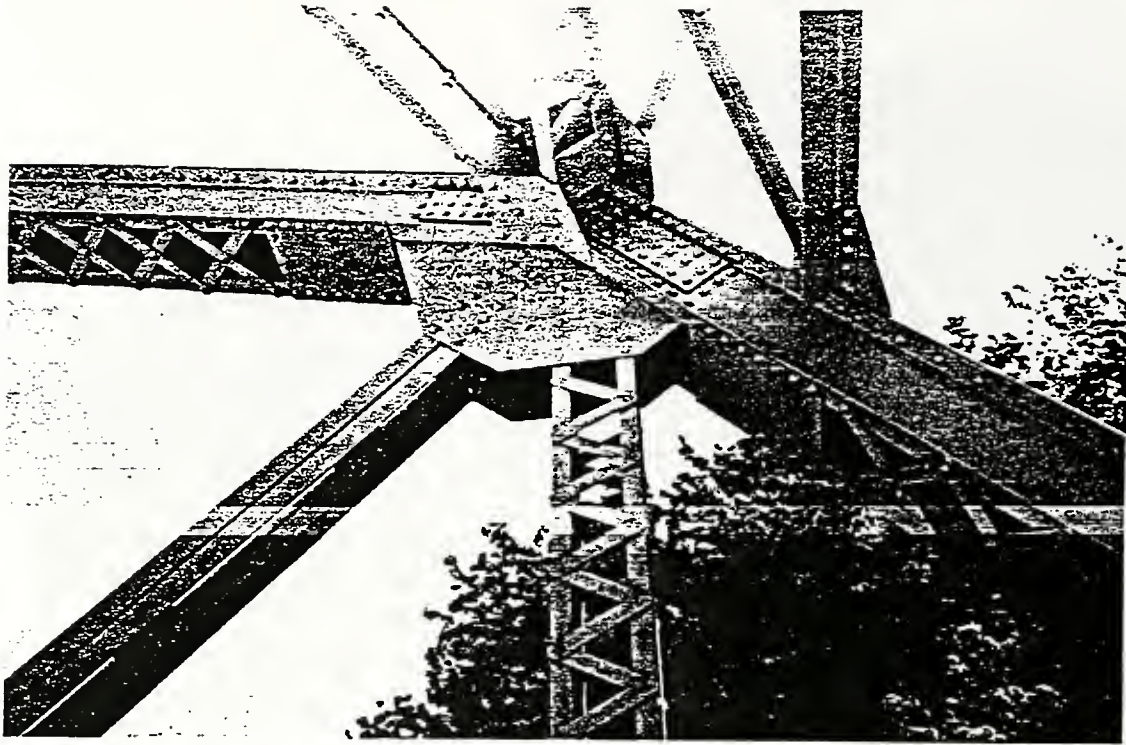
Top chord, vertical, diagonal joint detail
